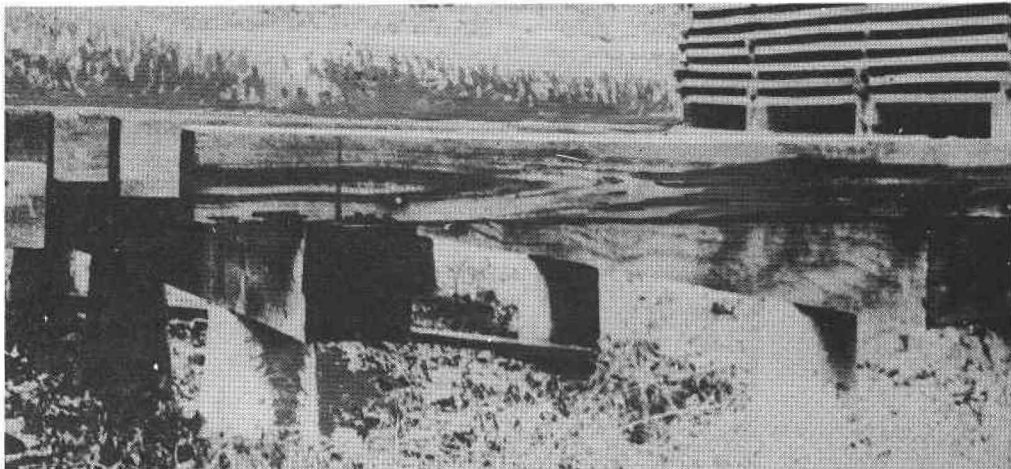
This foundation for hand-stacked piles consists of concrete piers, stringers, and crossbeams and provides ample ground clearance.
